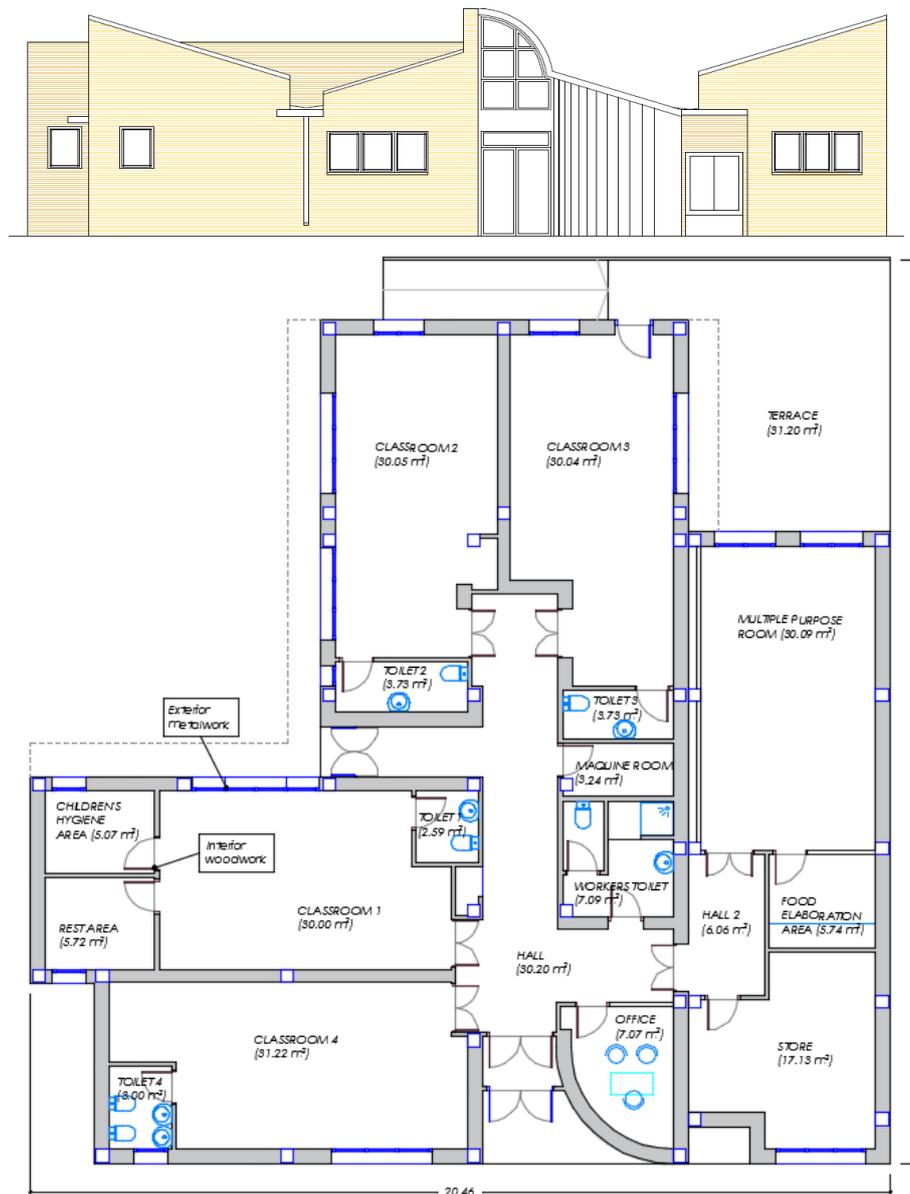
Building to provide a day-care service. Plant layout and main facade
